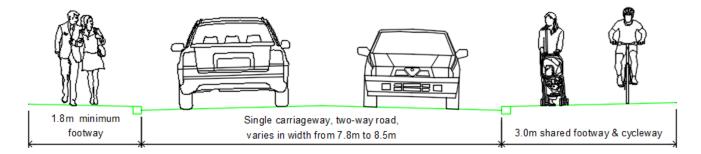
Dublin St Cross Section – with parking bays
